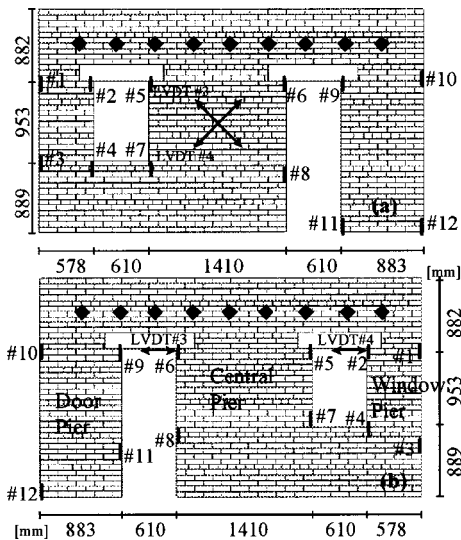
Location of LVDTs and clip gauges: (a) west wall elevation and (b) east wall elevation
